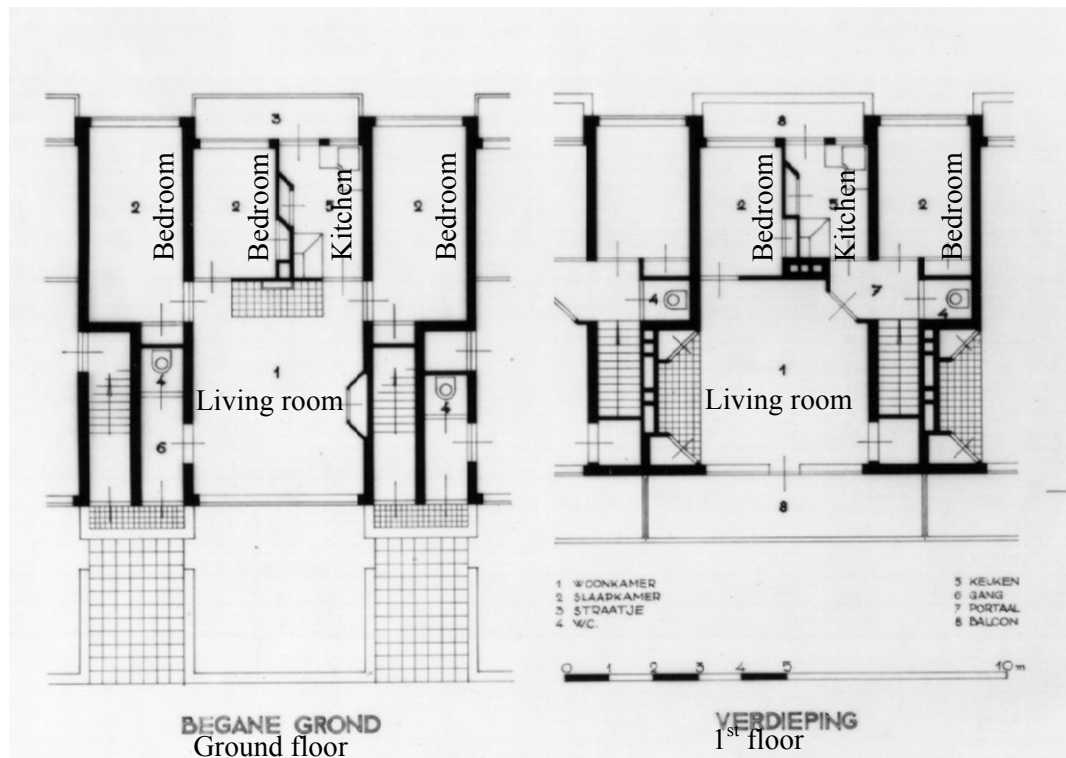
Row Houses, Hoek van Holland, 1924, plan layout
